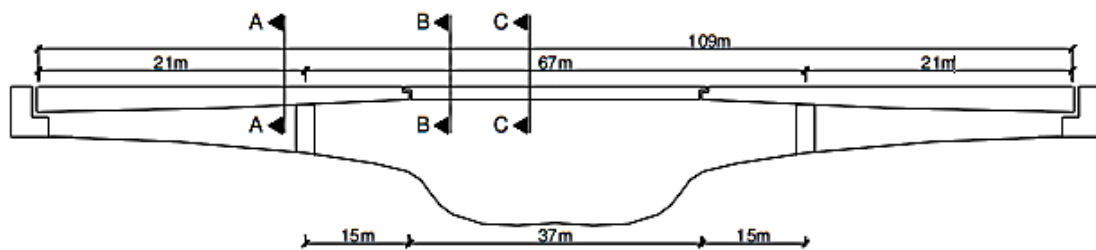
Longitudinal section of Awash River Bridge (1966)
